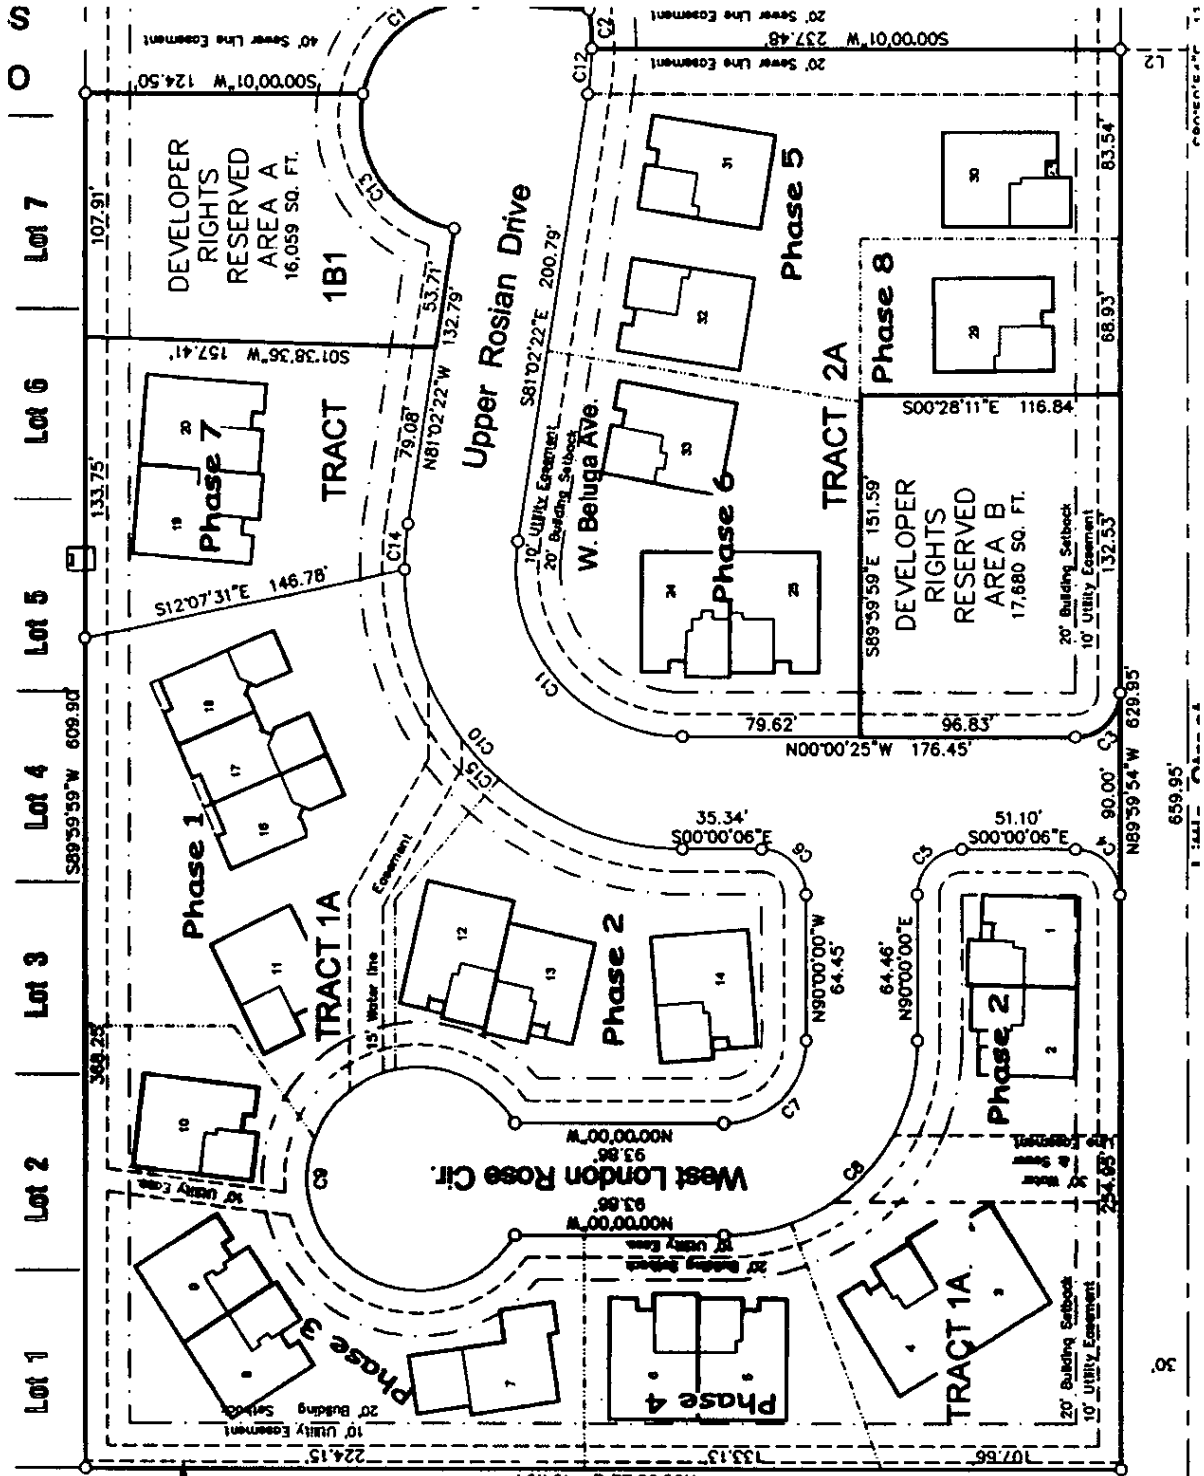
(page 1) - DEVELOPMENT PLAN
